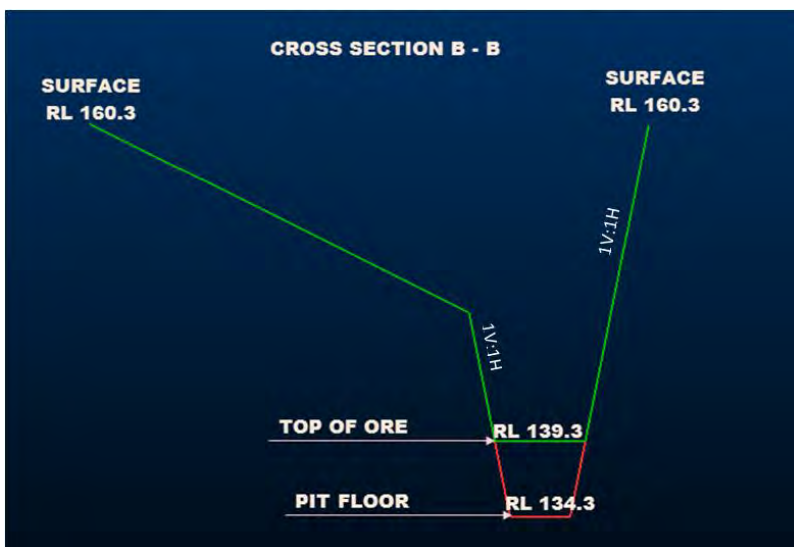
Cross section B-B at test pit (vertical exaggeration = 5.0)
